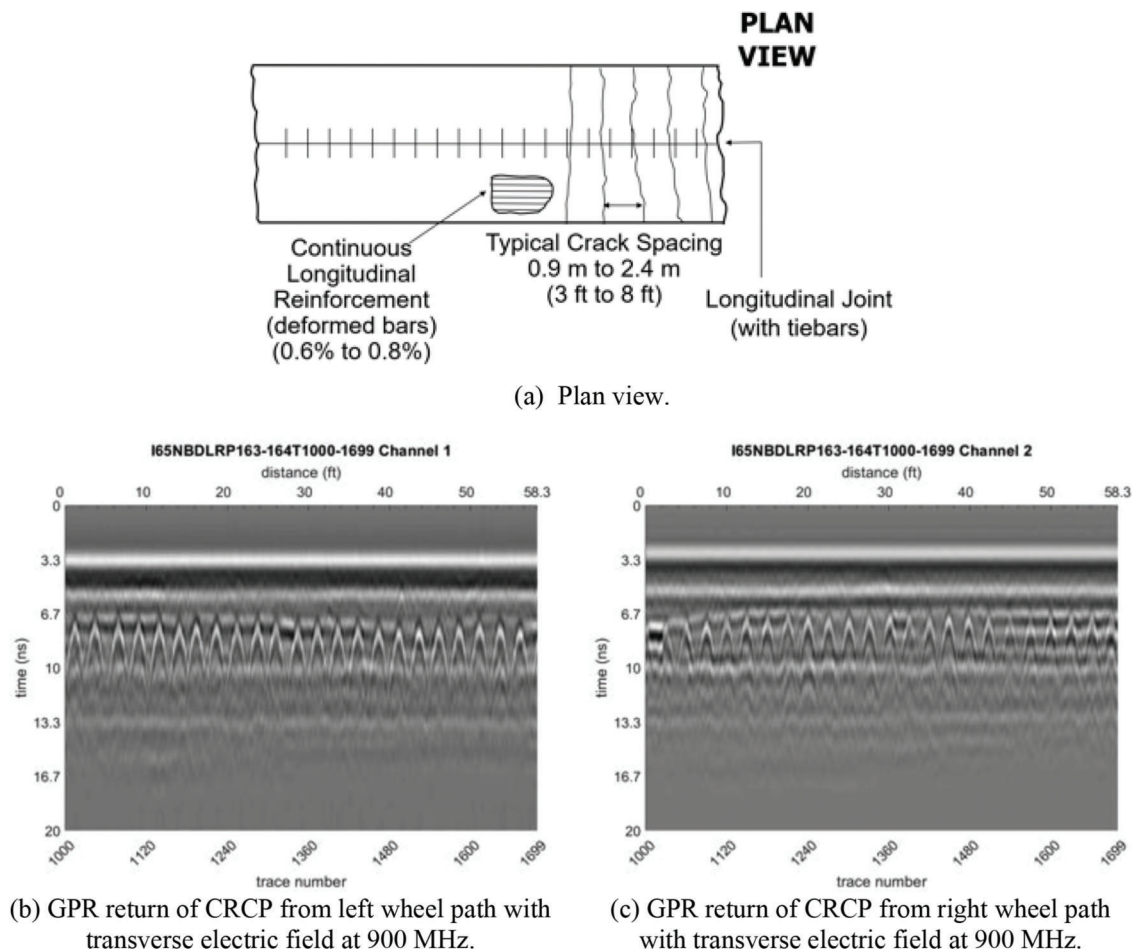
Continuously reinforced concrete pavement (CRCP).
